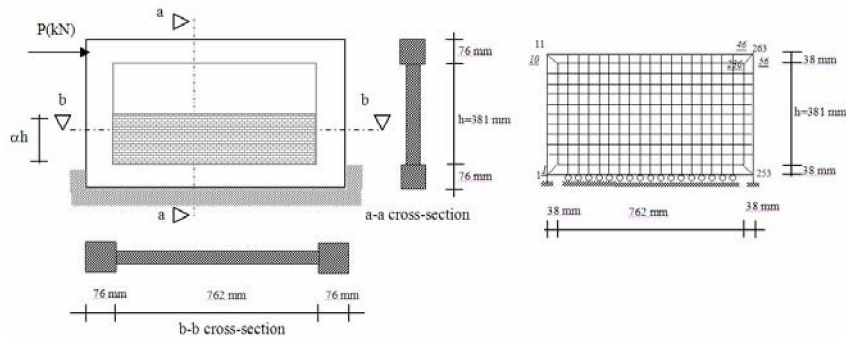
Frame-infill wall 1b. Mesh model of with full infill wall
